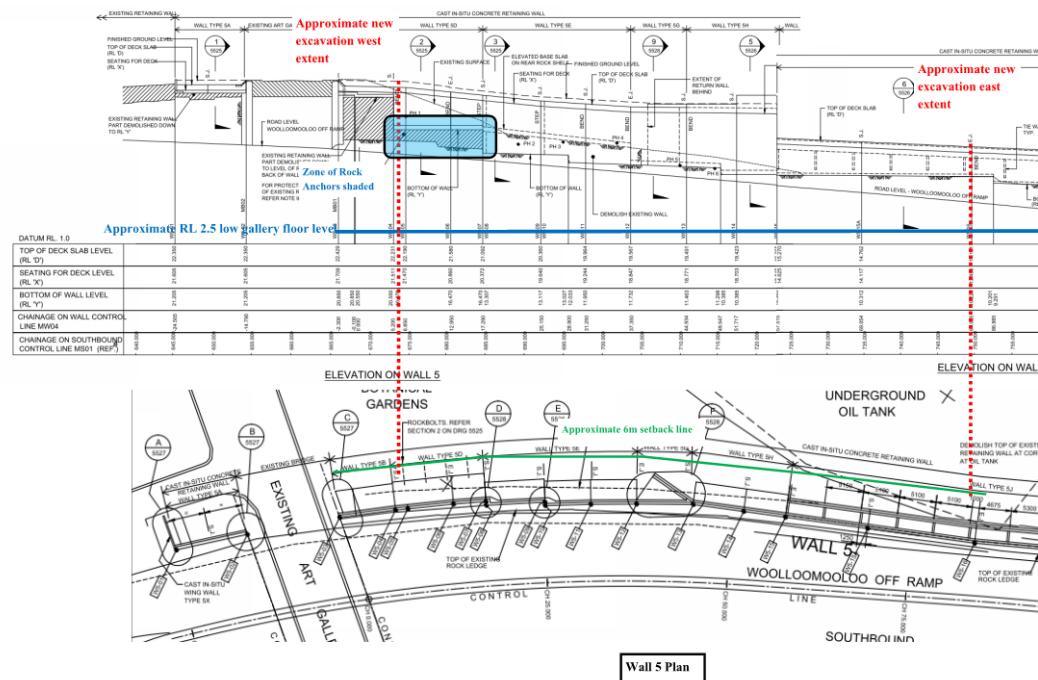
Proposed limit of nearest excavation below land bridge north wall footing (green line on plan)
